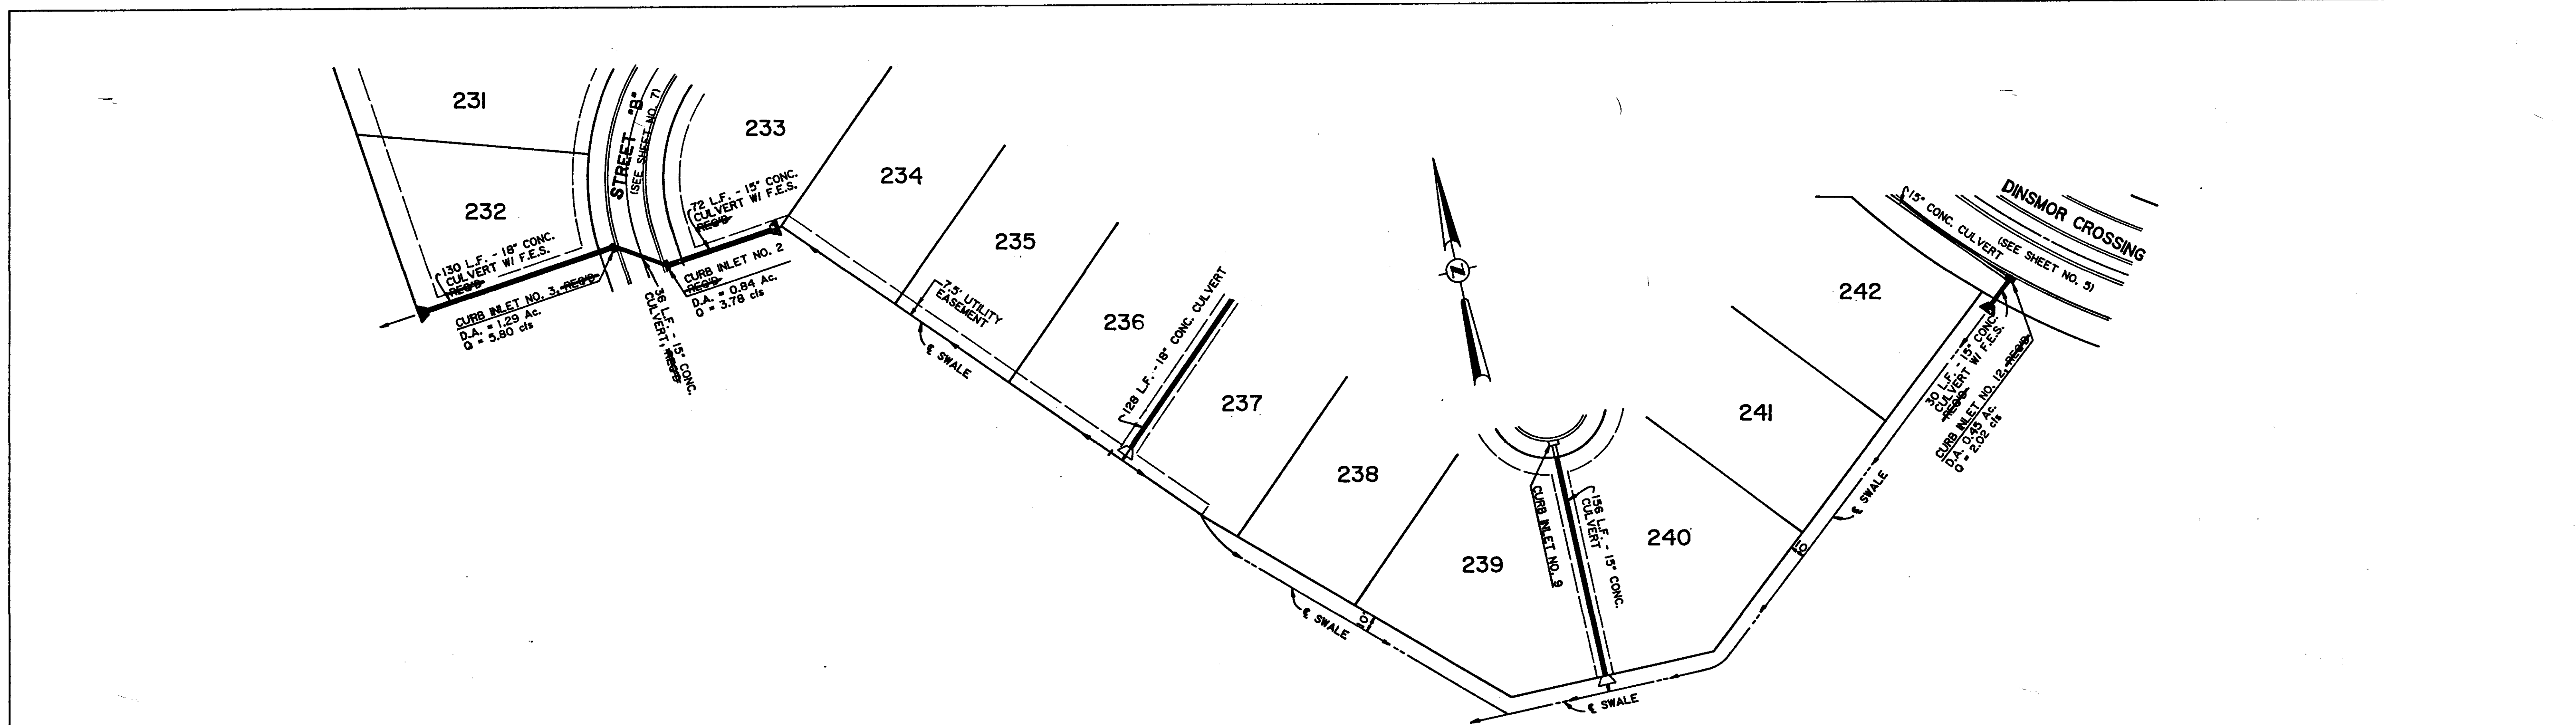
SINGLE PLAN AND PROFILE FULL DOT
